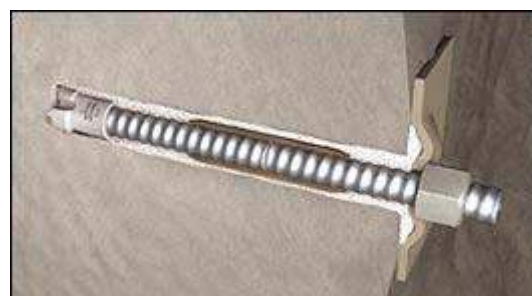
Self Drilled Rock bolt (photo: Mining & Construction; Atlas Copco, 2003)
